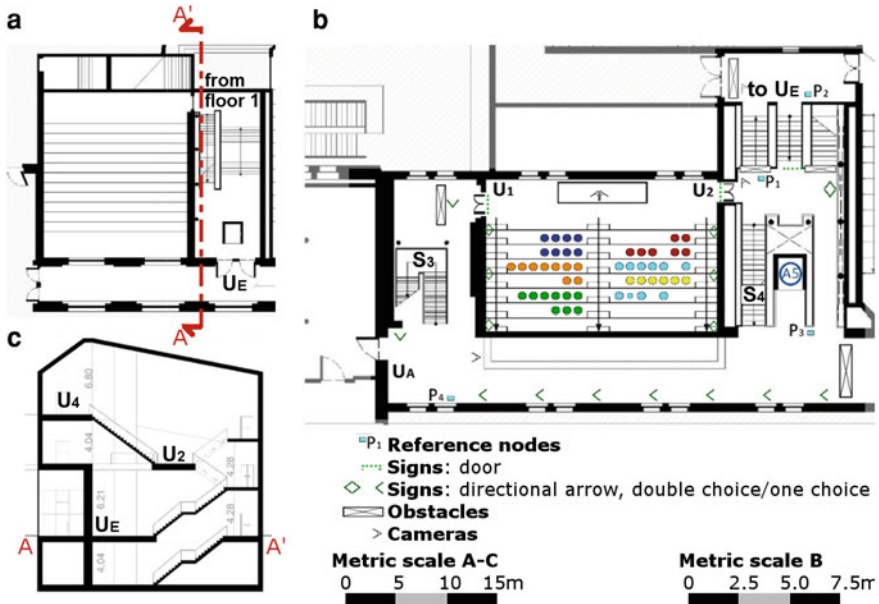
The scenario characterization: a ground floor layout; b first floor layout, by including symbol explanation (dots are the individuals' positions in both the tests; each colour refers to a group); c section view of the building
